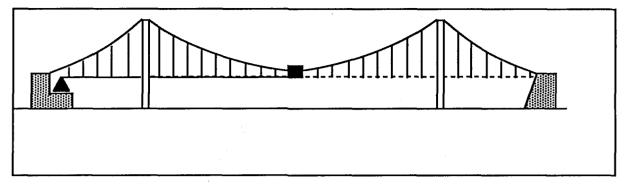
THREE-SPAN SUSPENSION BRIDGE WITH A CENTRAL CLAMP AND A FIXED BEARING ON ONE OF THE ANCHOR BLOCKS
